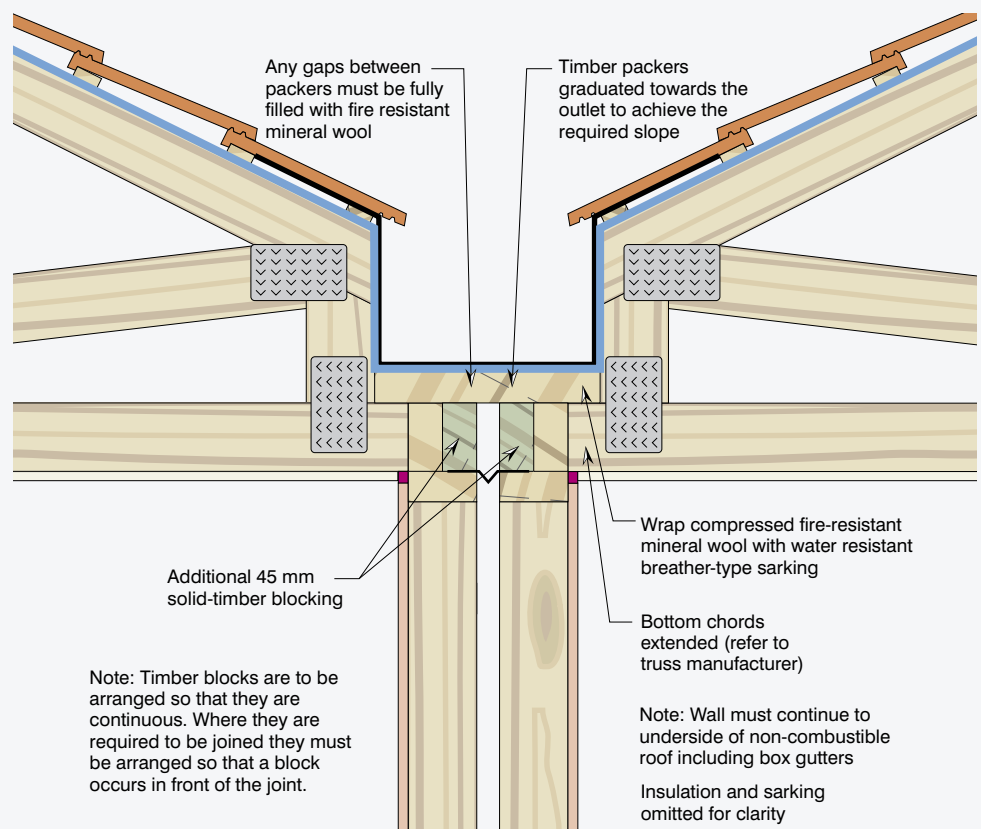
Timber blocks used to maintain fire-resistance – FRL 60 minutes under box gutter – elevation view.
